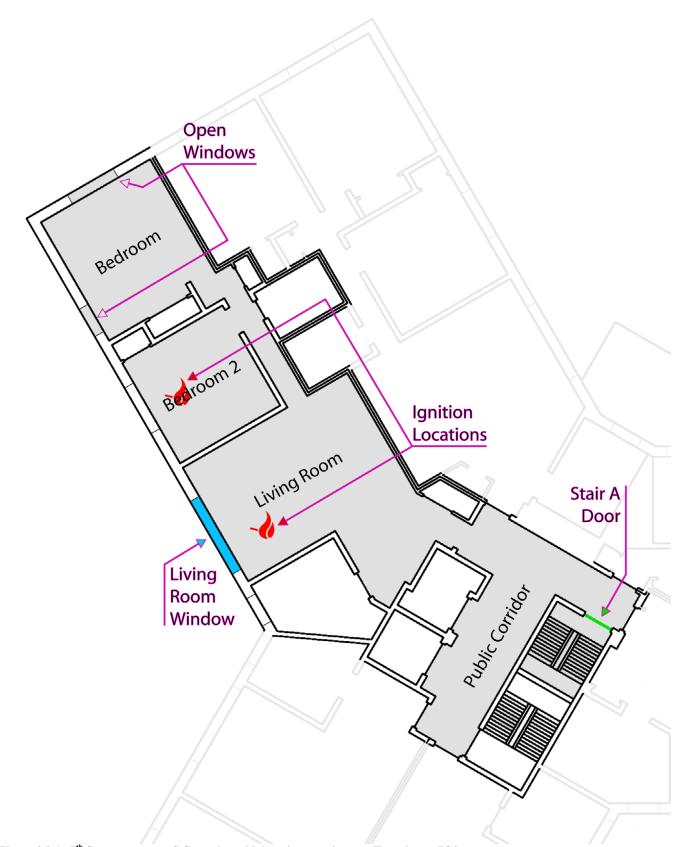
7<sup>th</sup> floor apartment G floor plan with locations pertinent to Experiment 7G2
